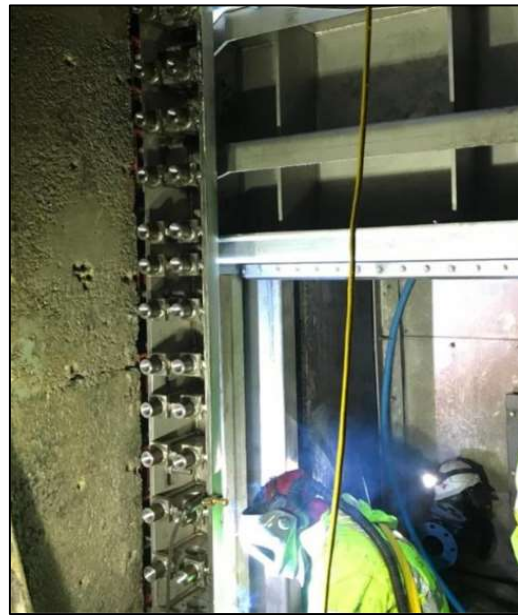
Welding of primary gate to existing tower structure (MMB)
